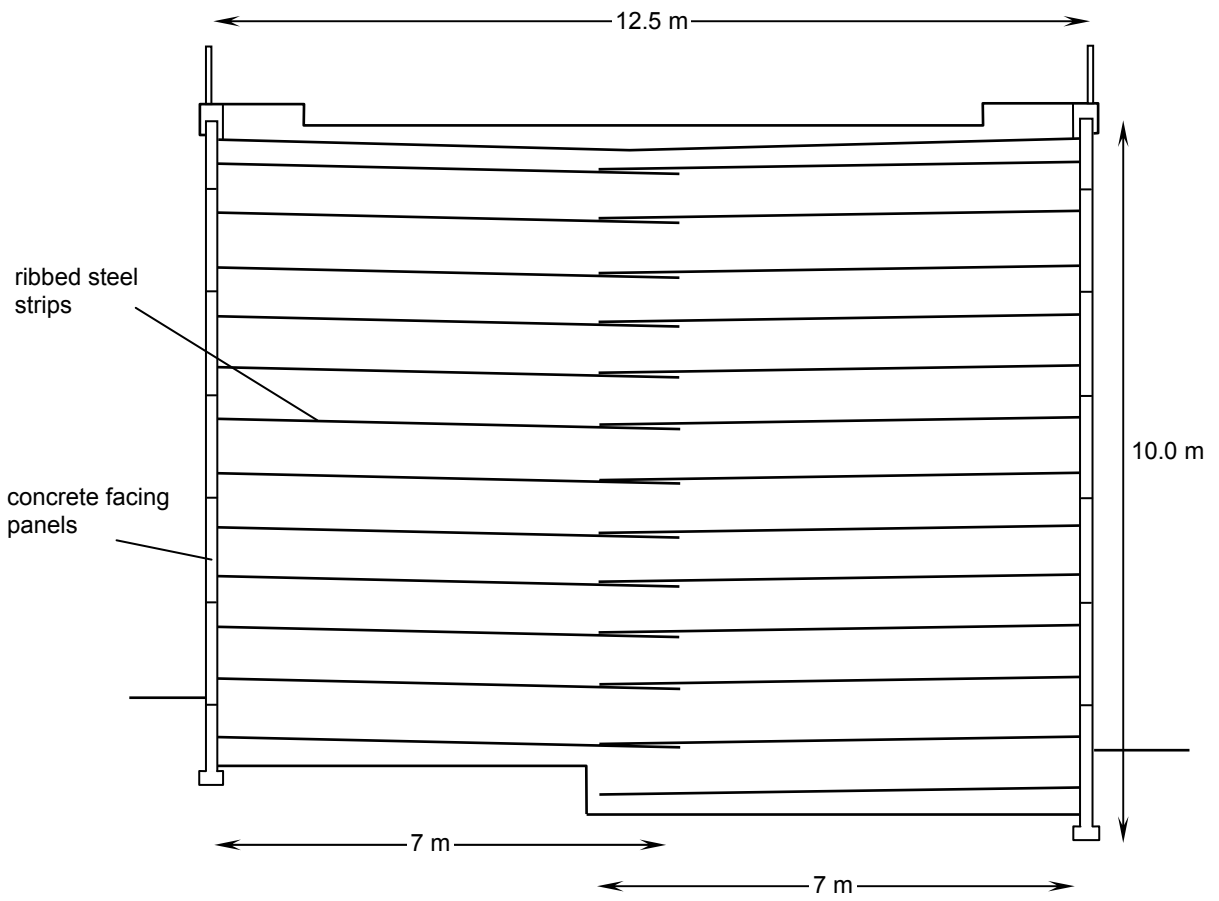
Cross section of the Arifiye Reinforced Earth Walls
